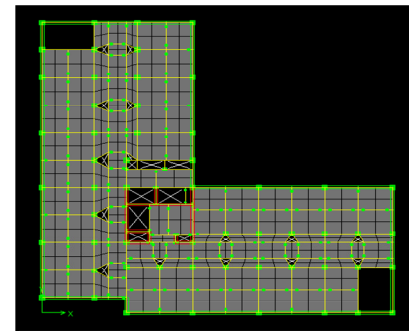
Replacement of Shear Wall with Bracing (Provision of Bracings Locations are Indicated in Red Color)
